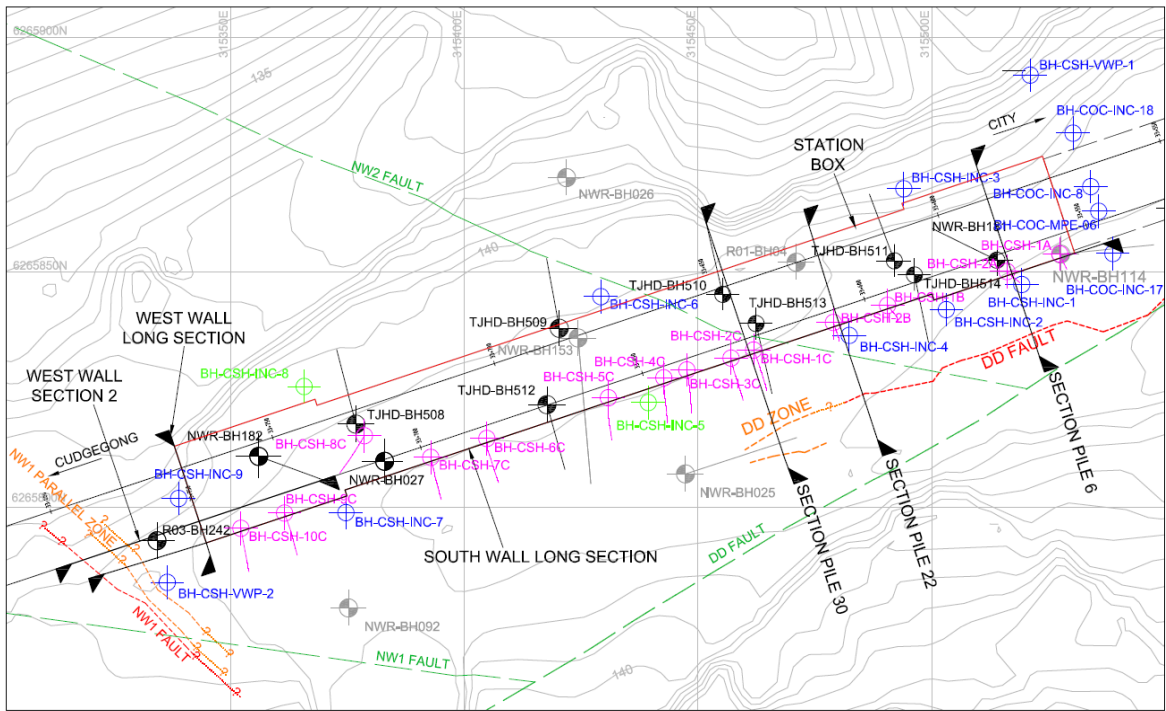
Plan View of Inferred Dural Dome Fault at Castle Hill Station (after PSM Report)
